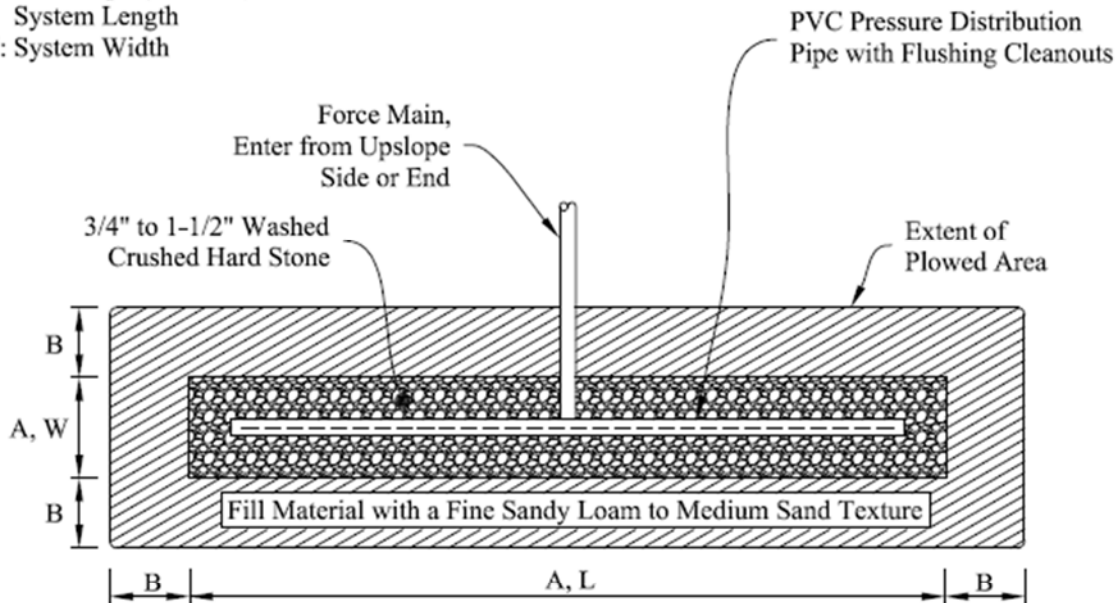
Detail of Typical Trench Wastewater System With 24 Inches to 5 Feet of Limiting Soil
